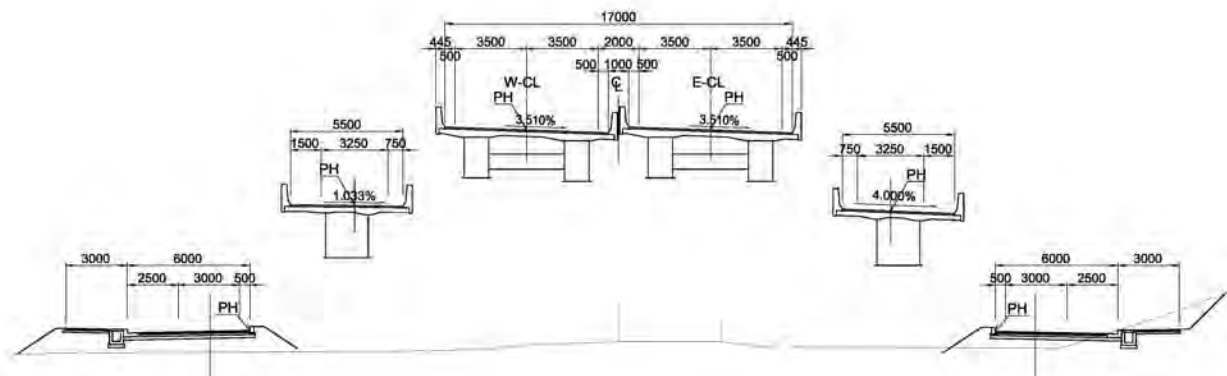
(3) Typical Cross Section of ON-OFF Ramp Section
